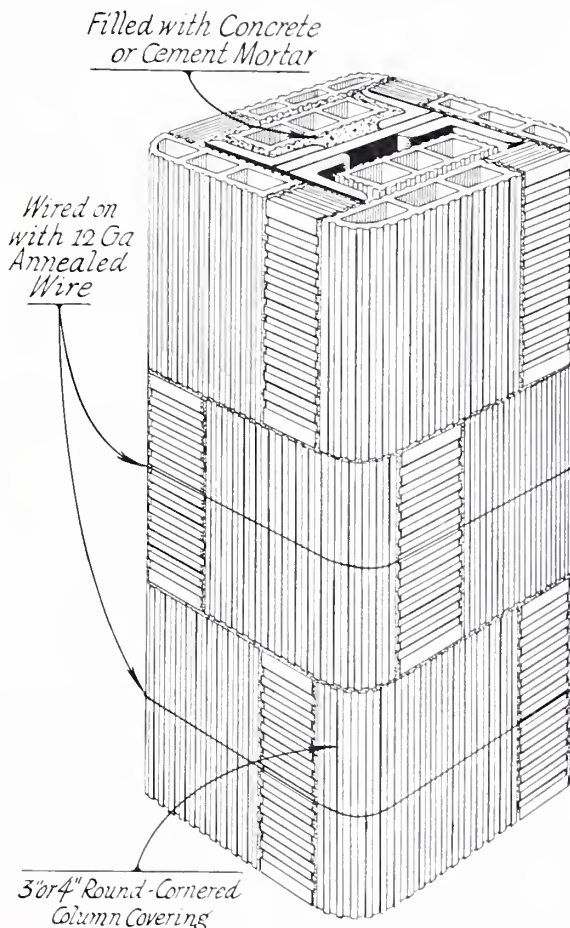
Application of round corner column covering to built-up "I" Column, showing use of partition tile "pieces" as fillers and method of wiring tile in place.
